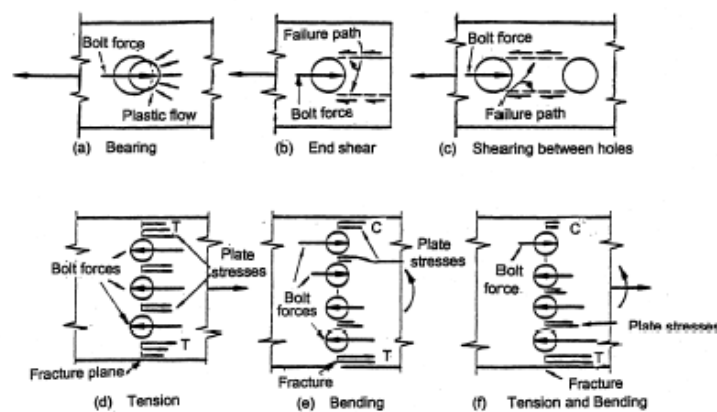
Bolted Plates in Bearing, Shear, Tension, or Bending
